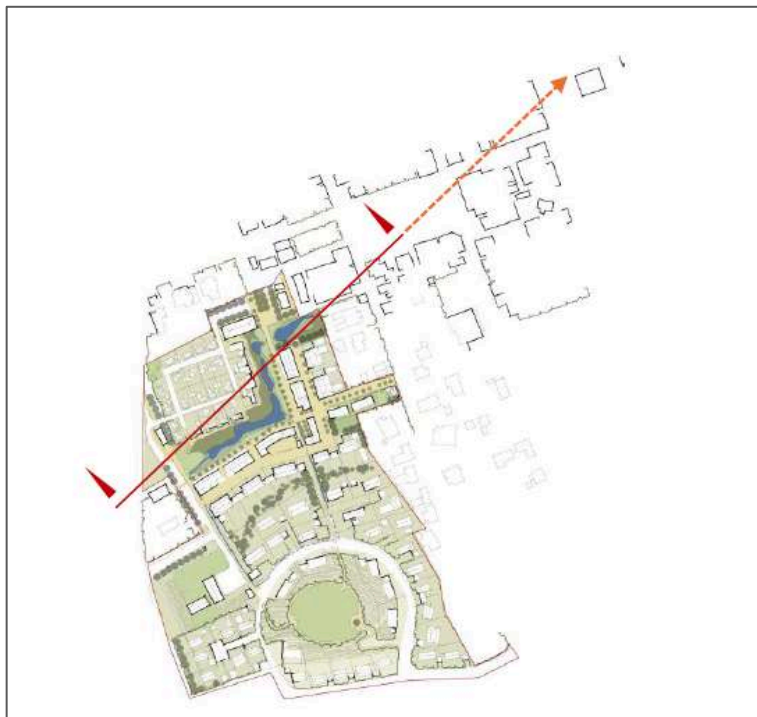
Section FF from the indicated position on Church street, over the proposed development, toward the church, Britz 2026
